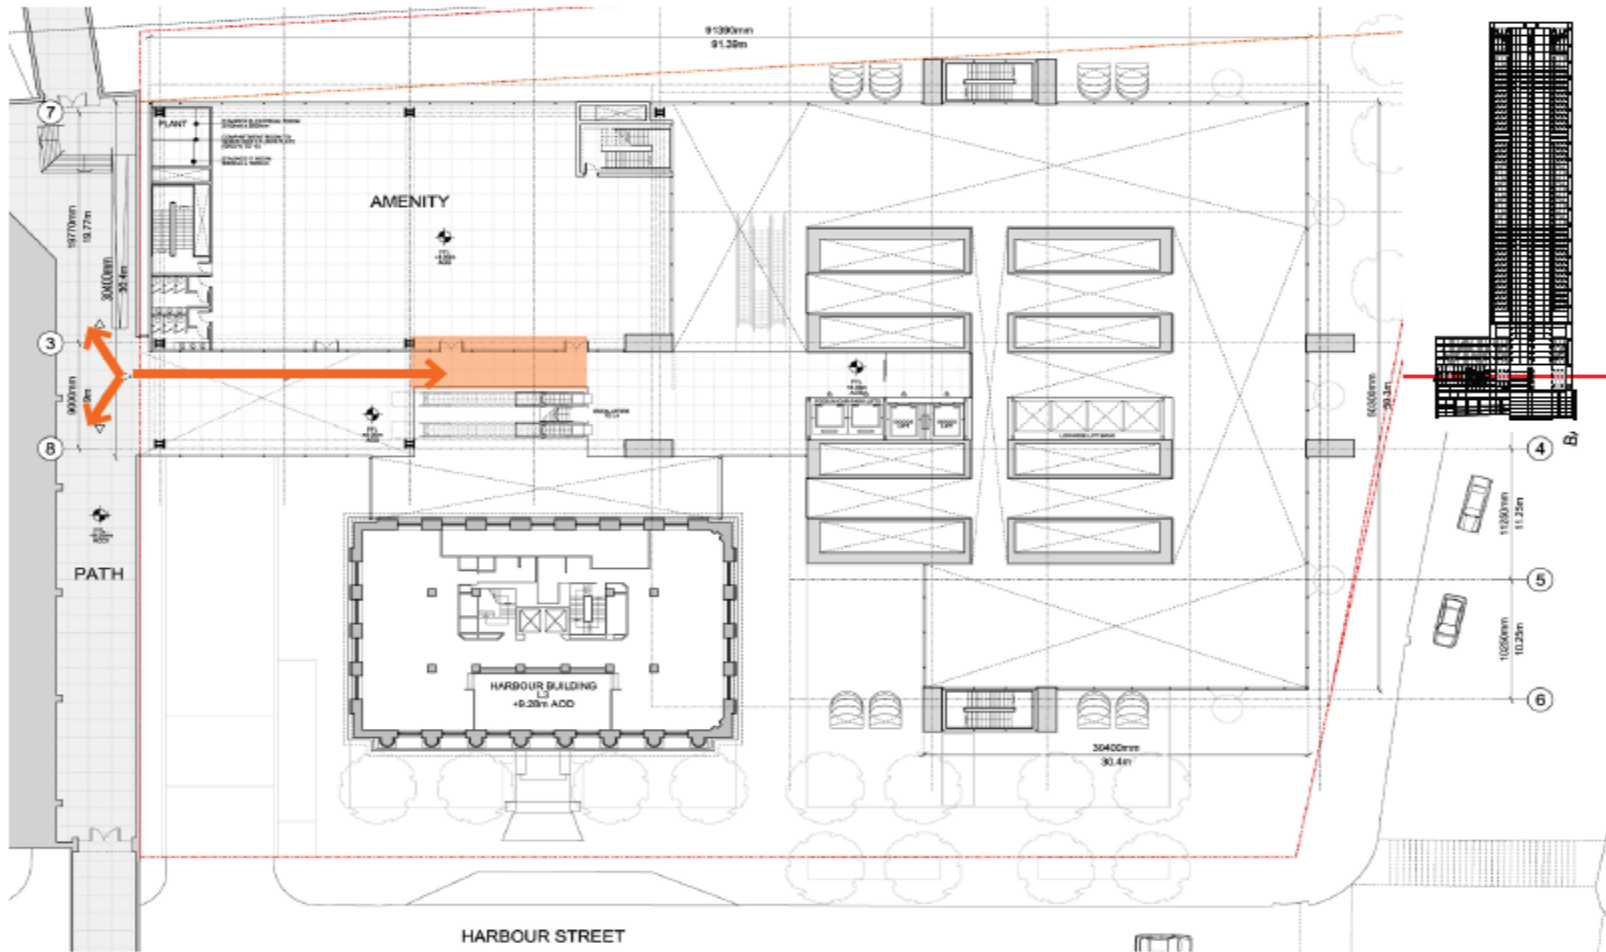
30 Bay Street Level 3 plan - connection to the PATH network
